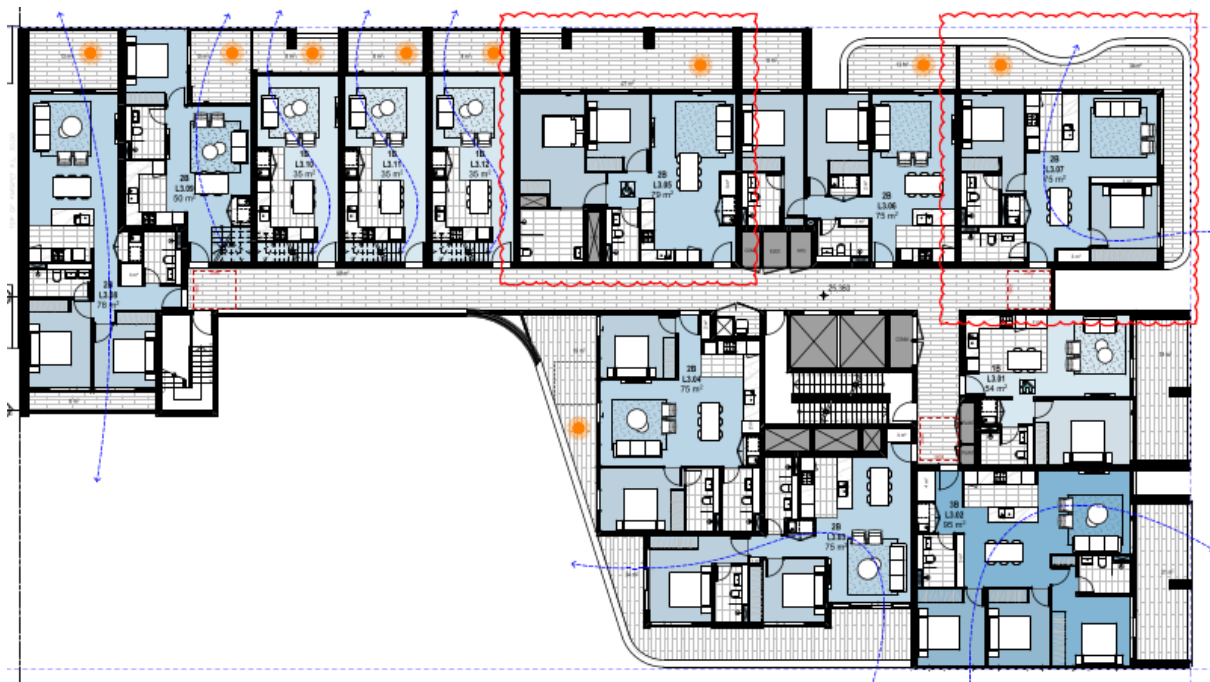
Extract of the approved floor plan of Level 3 in DA2016/170/2.
